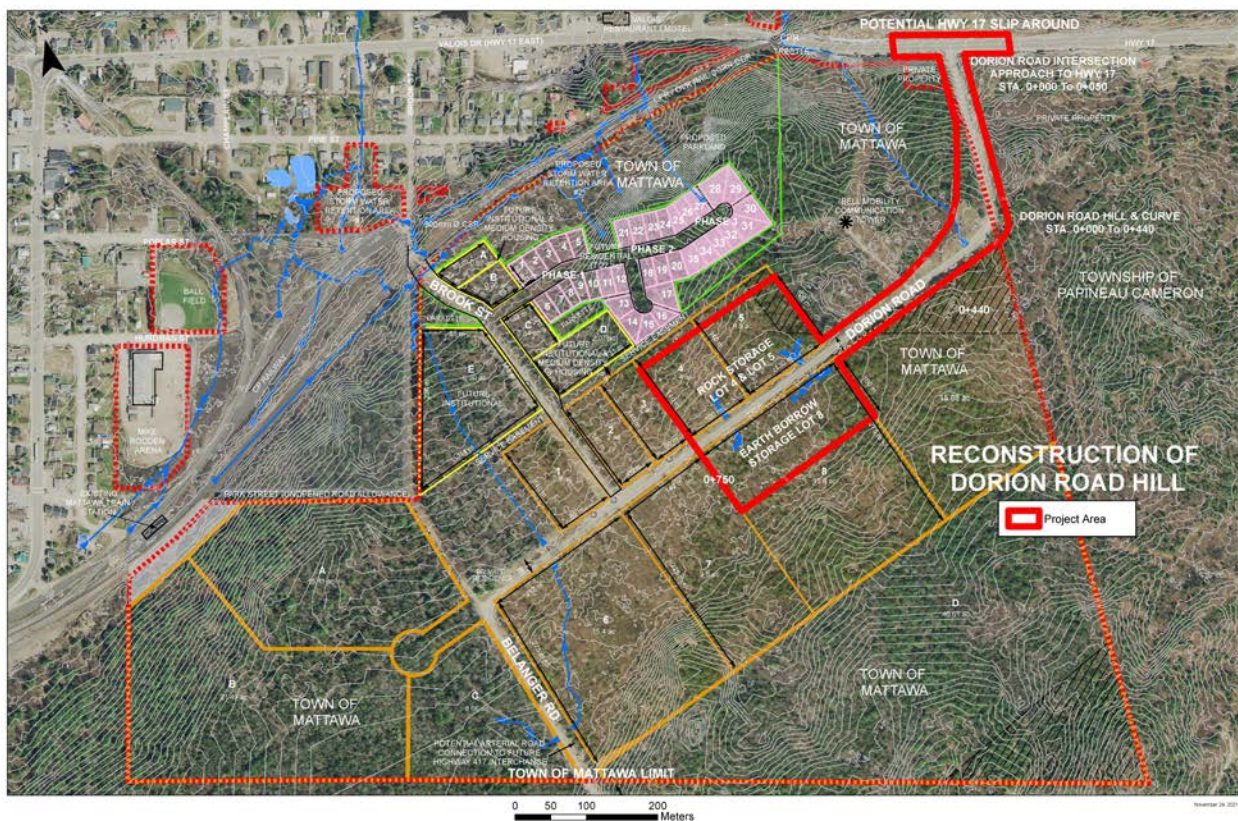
Dorion Road Hill Reconstruction Project Area .....	1
